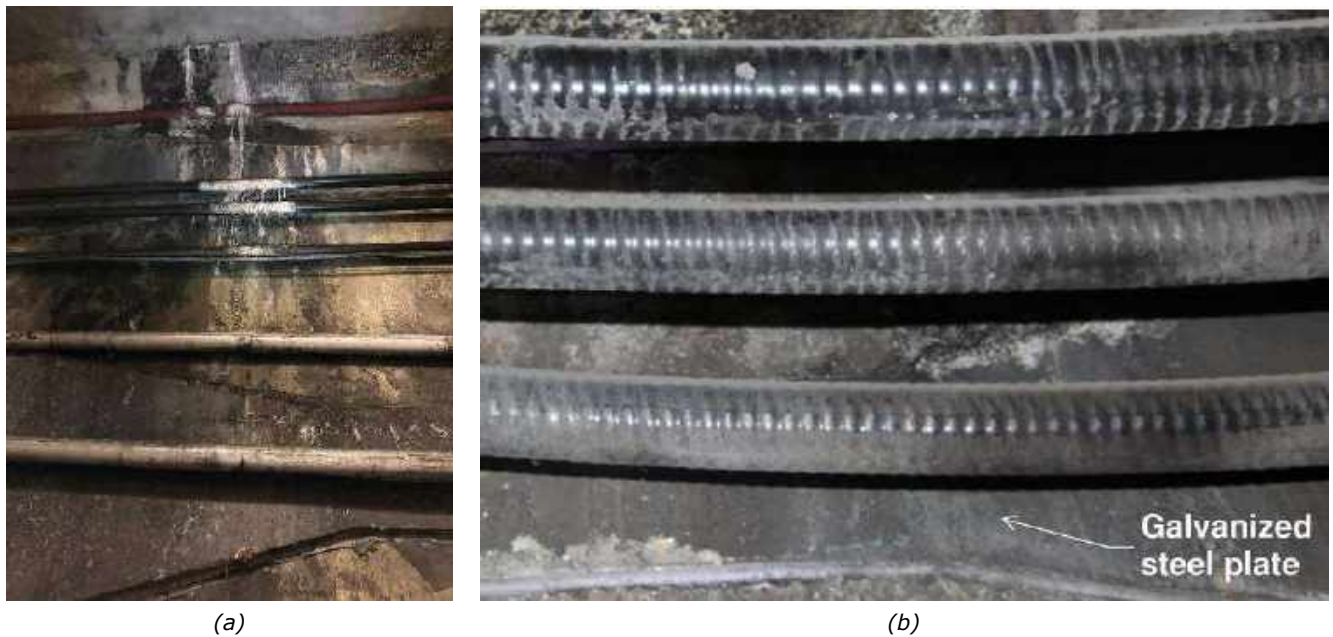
Efflorescence in the outer wall joints at (a) Upstream Air Duct, Joint I/II and (b) Downstream Air Duct, Joint IV/V.
